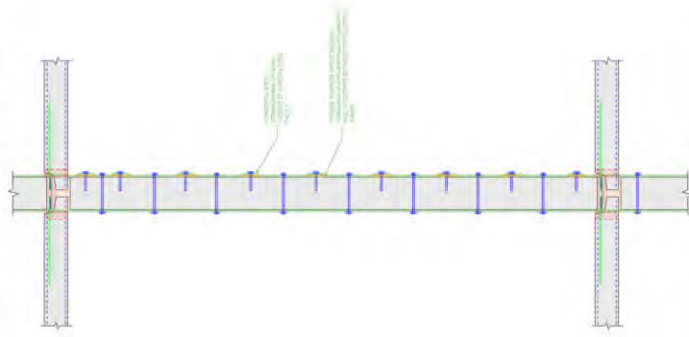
Cross-section view of wall indicating arrangement where vertical and horizontal strengthening plates are required.
